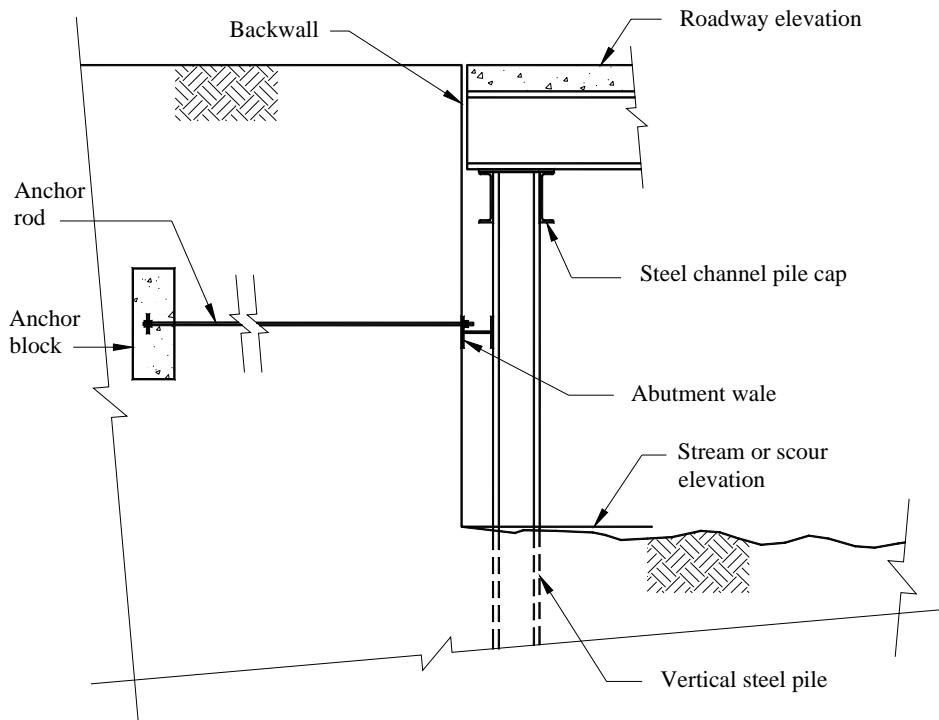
Typical Iowa county stub abutment using a steel channel pile cap.
